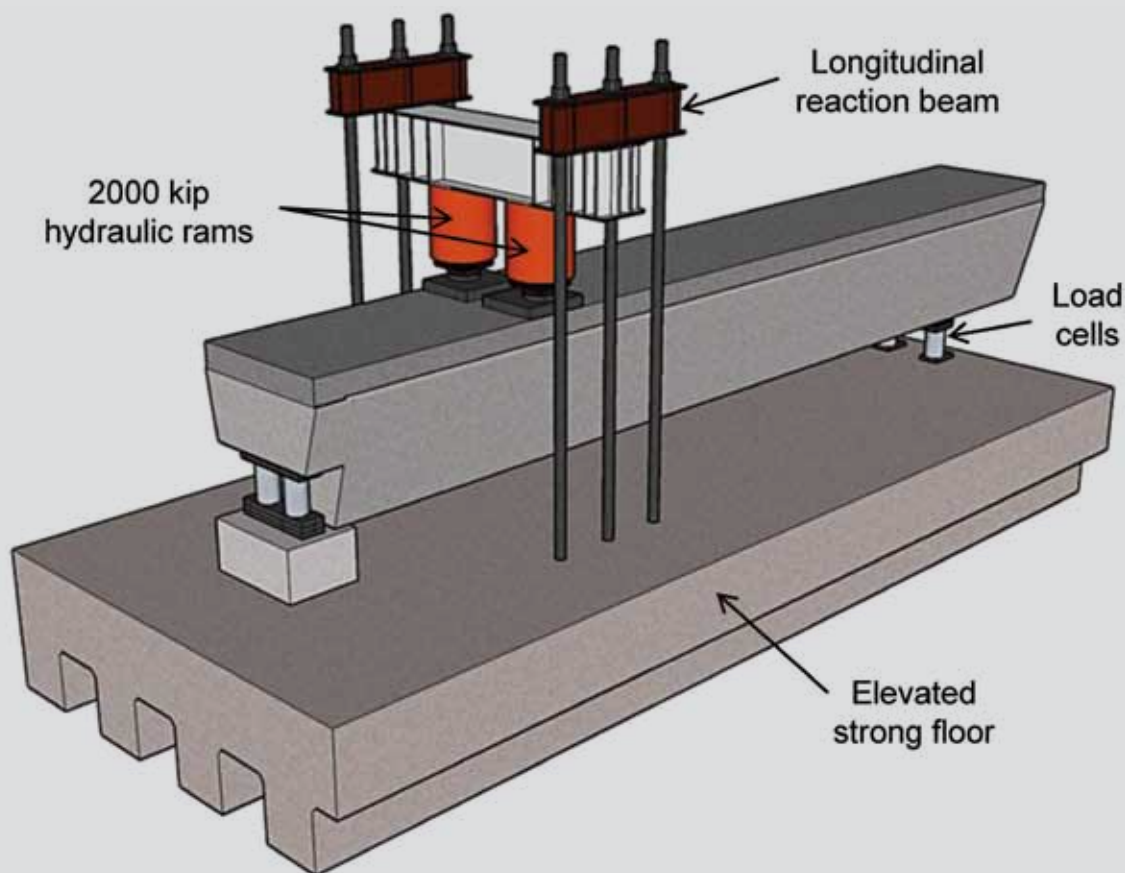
Test setup. Note: 1 kip = 4.448 kN.
